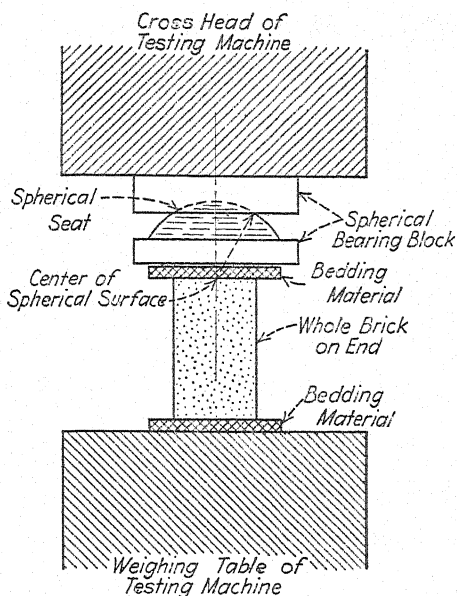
Recommended Design for Crushing Test Assembly, Including Bearing Block.
